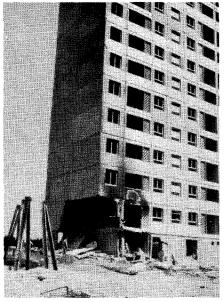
Algerian bearing wall concrete building which survived a major explosion (Reference 1).
